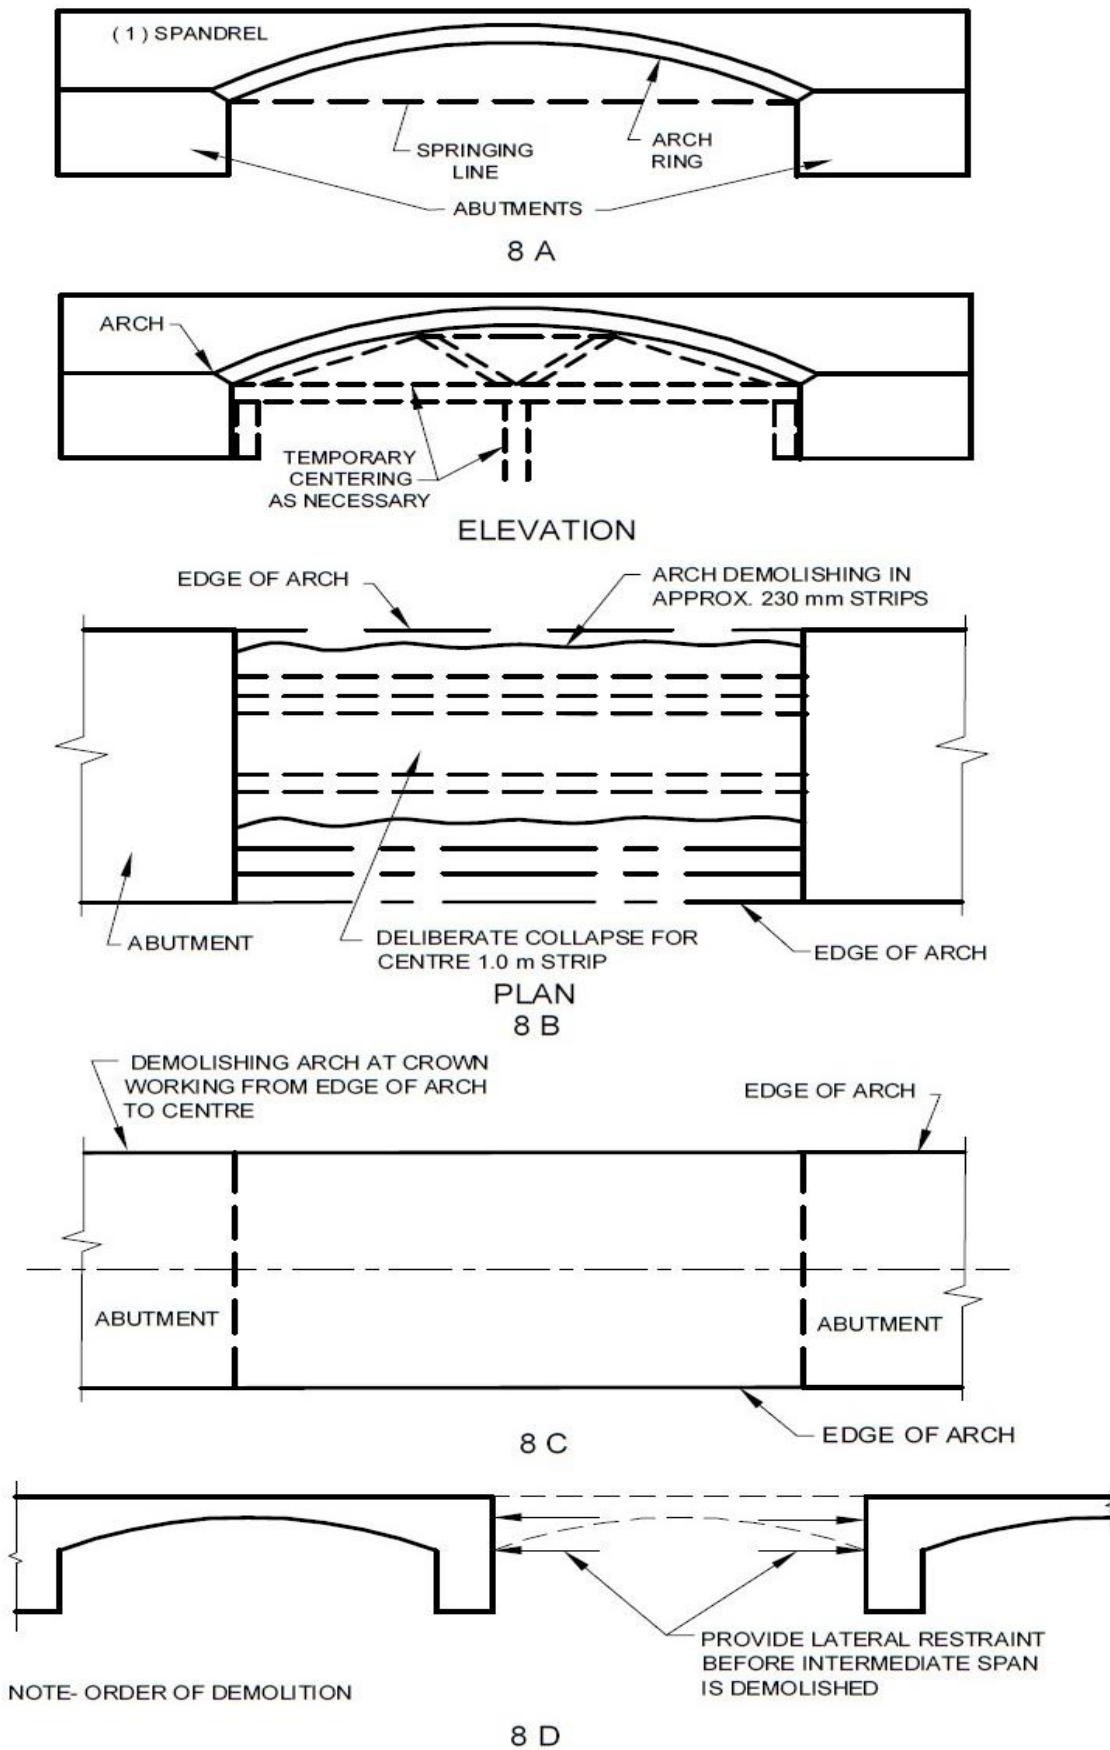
DEMOLITION OF MASONRY AND BRICKWORK ARCHES
